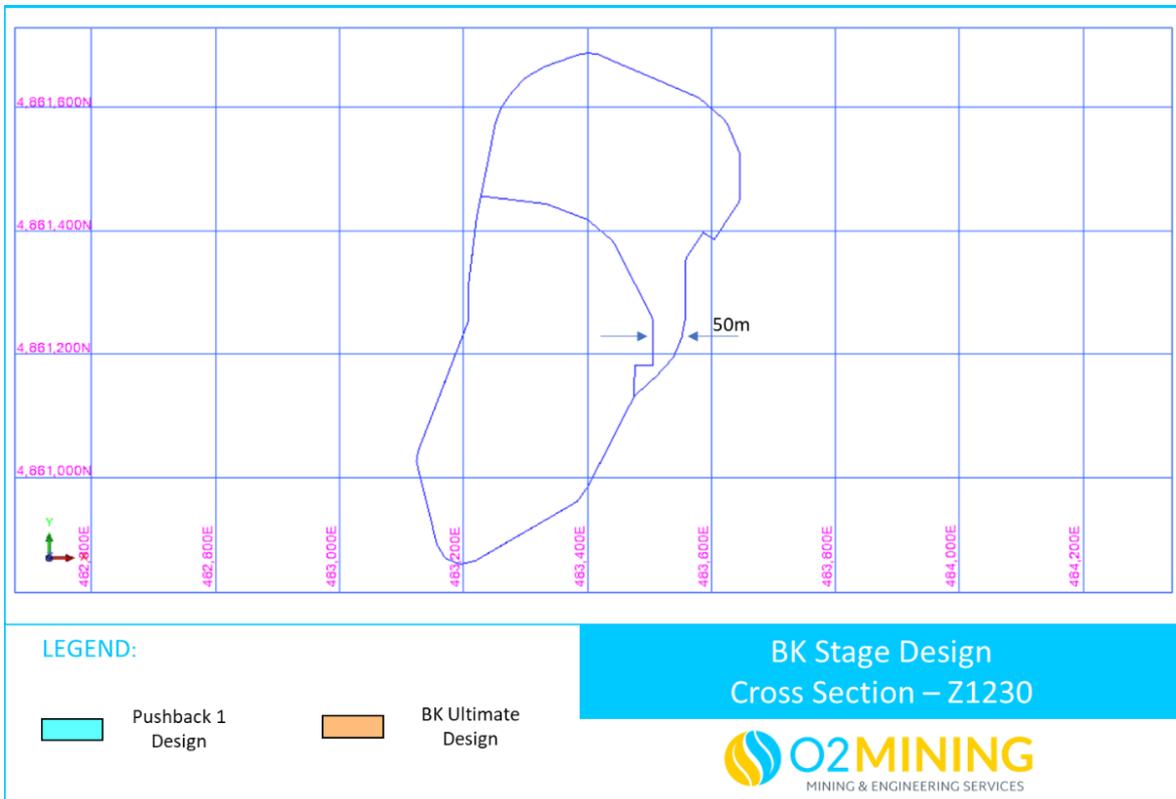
BK Stage Design Cross Section – Z1230 (Source O2 2023)
